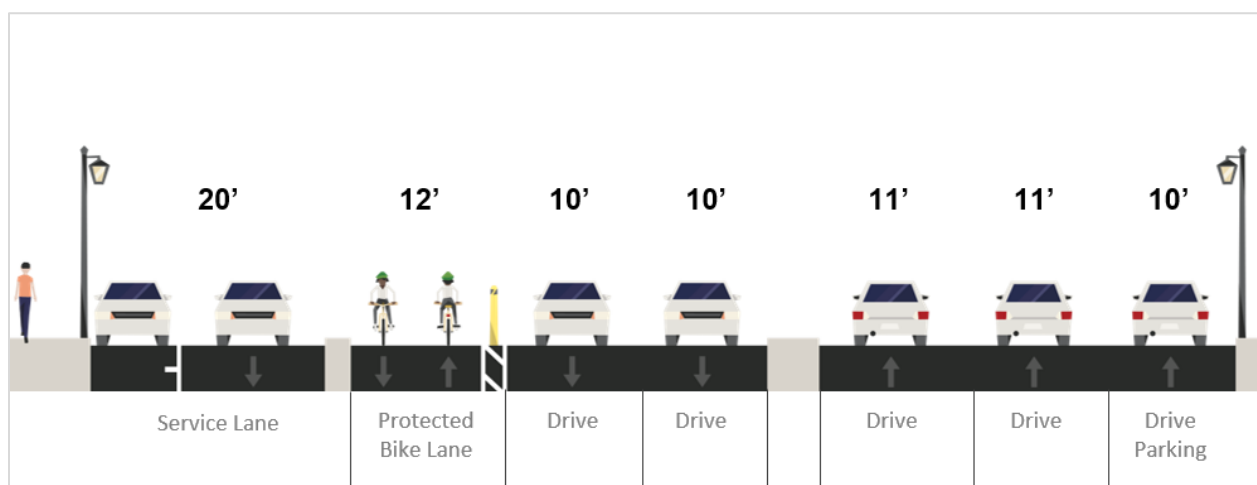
Typical section, proposed condition, New Hampshire Ave NW to G St NW
